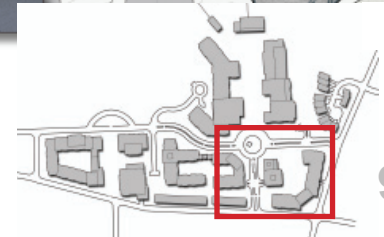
Detail Plan- Northeast Corner of Site (Cody Peratt 2009)
